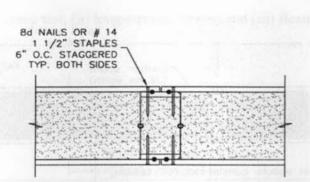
Typical cross section for SIP floor and roof foam-spline connection after assembly
